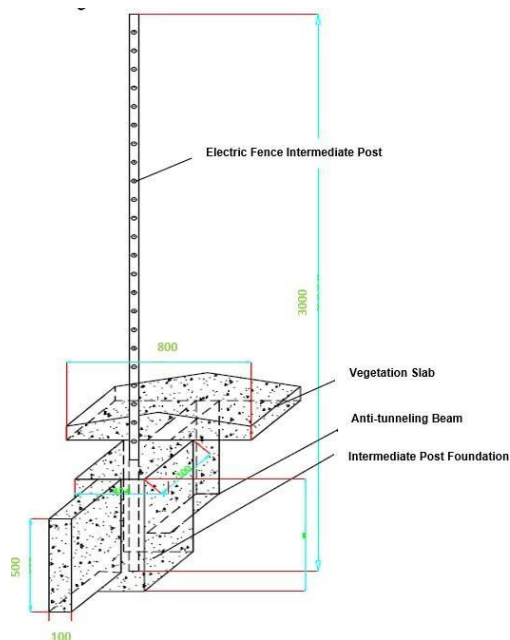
Vegetation Slab and Anti-tunnelling Beam General Arrangement
